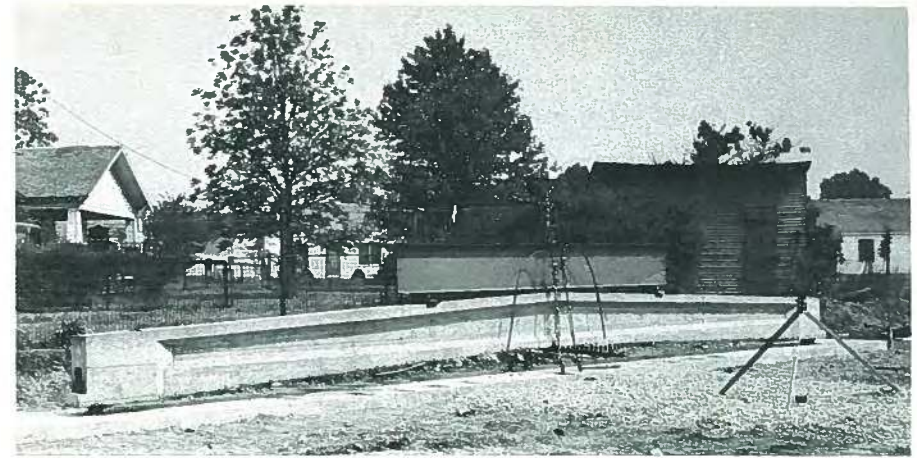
Test equipment in position on 40-ft (12.2 m) girder, Tulsa, Oklahoma.
